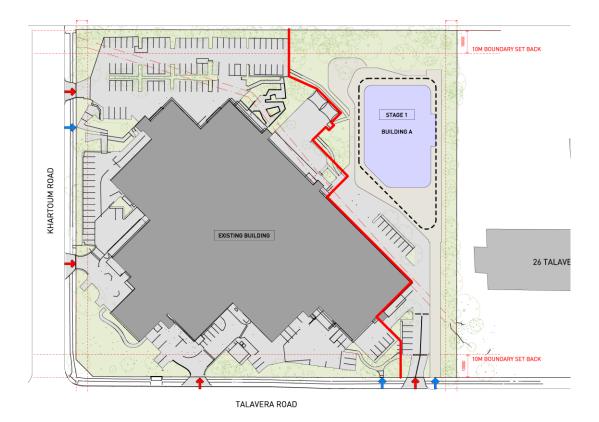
Stage 1 with Building A on the north eastern portion of the site and the retention of the existing building until Stage 2.
